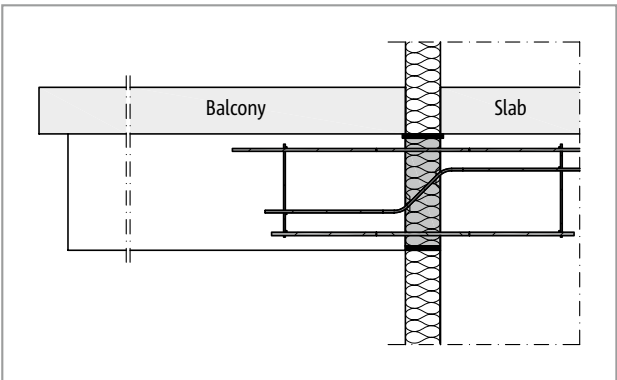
Schöck Isokorb® XT type B: Balcony construction with freely cantilevered downstand beams (prefabricated balcony)
